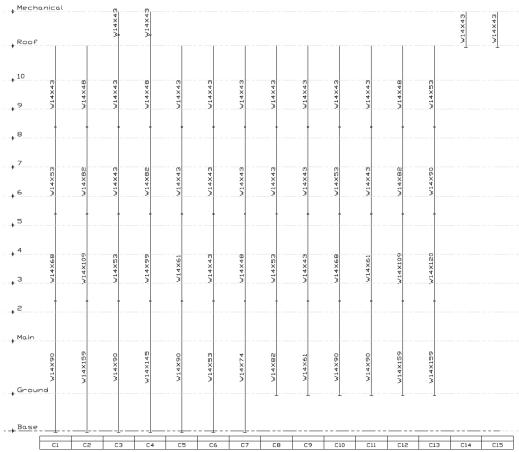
Gravity Column Schedule (See plans, next page, for location)
